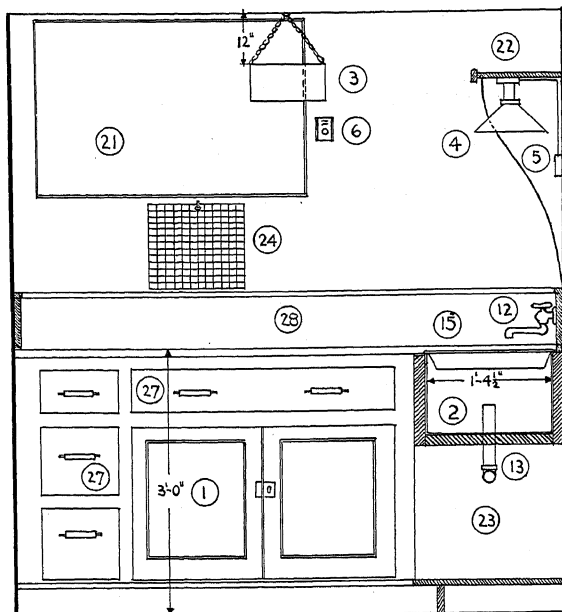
Elevation facing work bench showing enlarging table, cabinets and cross-section of sink
